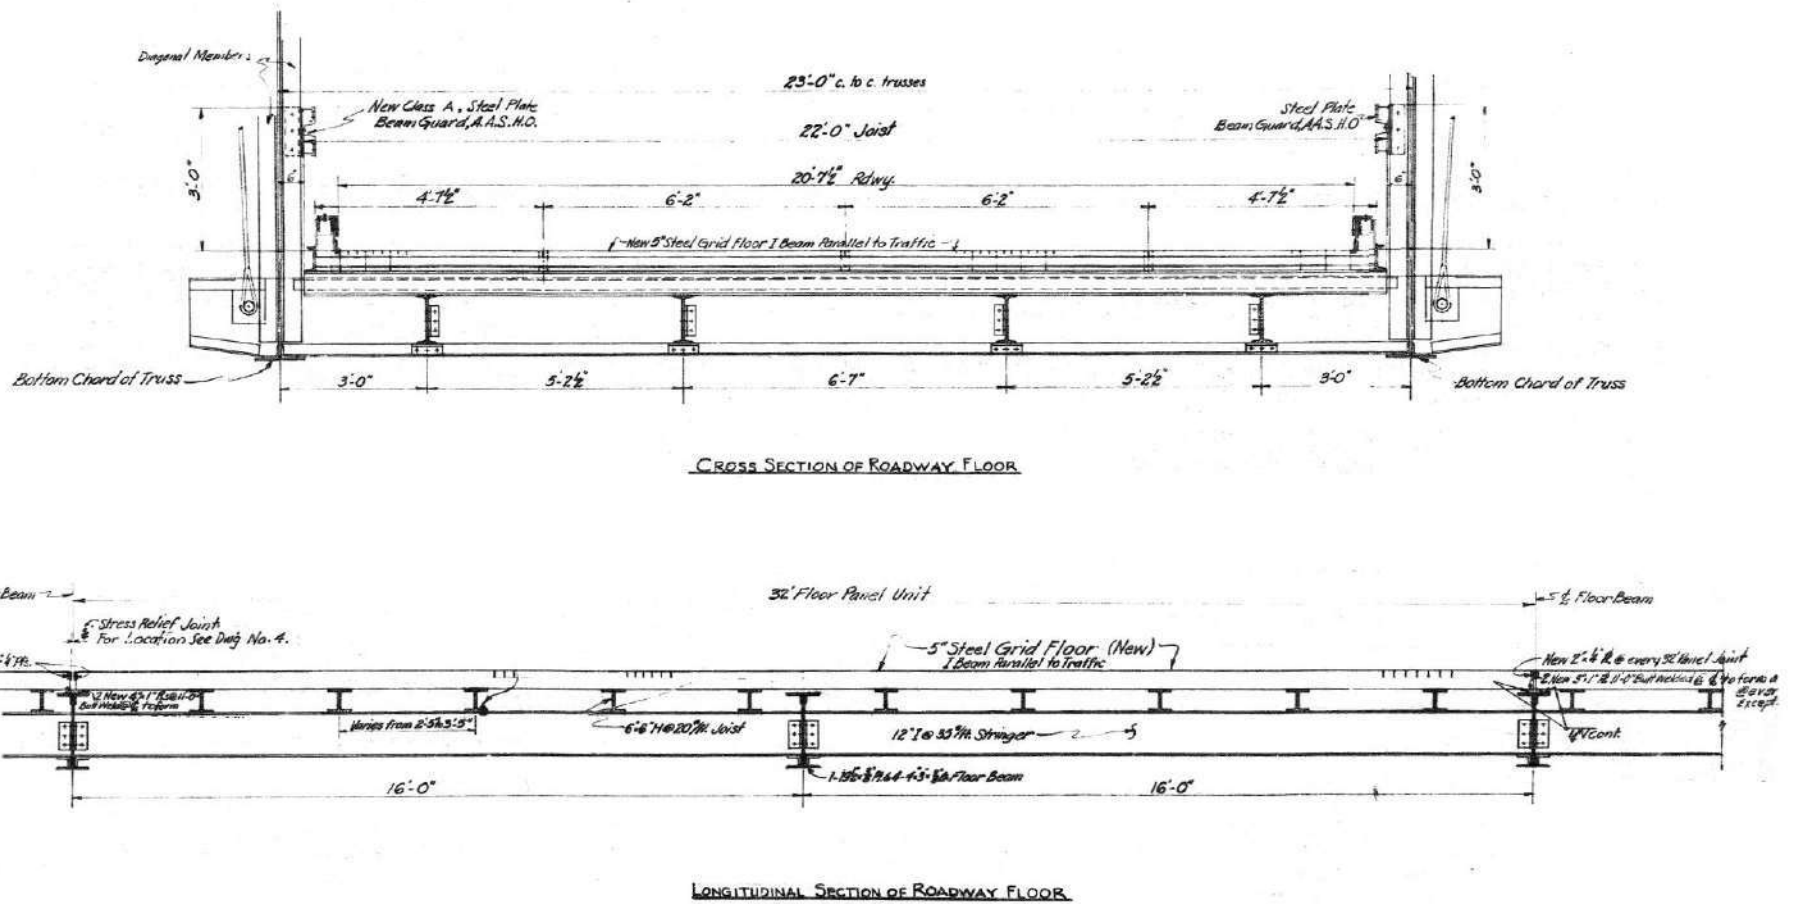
Transverse and Longitudinal Sections of Roadway and Floor System
